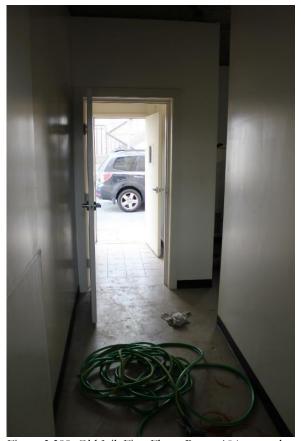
, Old Jail, First Floor, Room 104, general view looking west.
